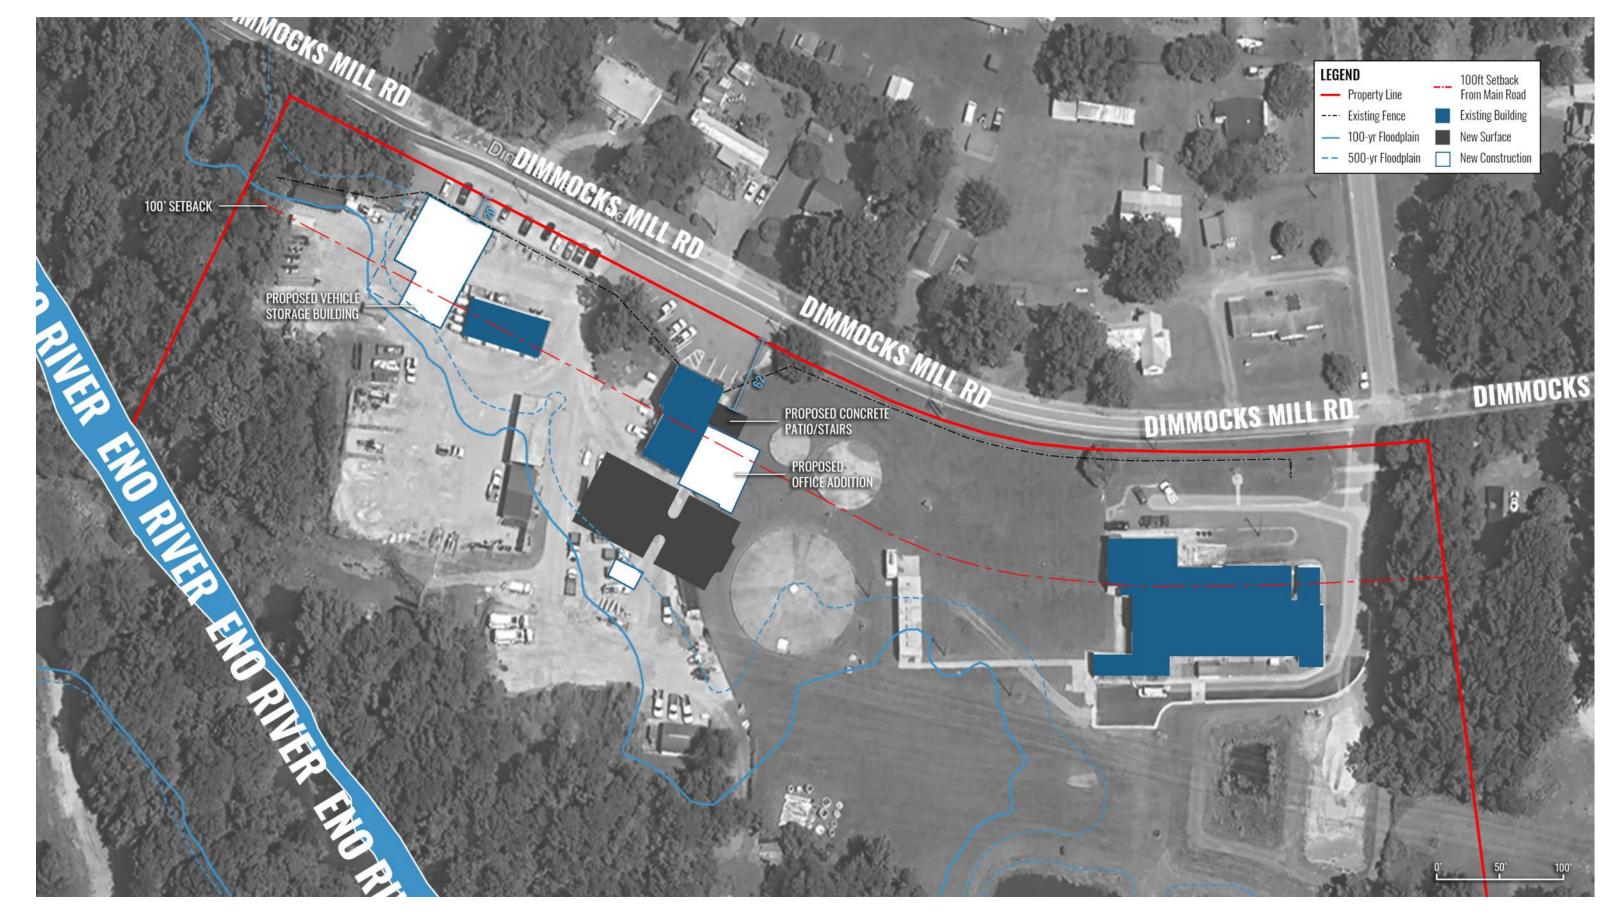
EXHIBIT C - As Proposed Setback Dimensions to New Structures
